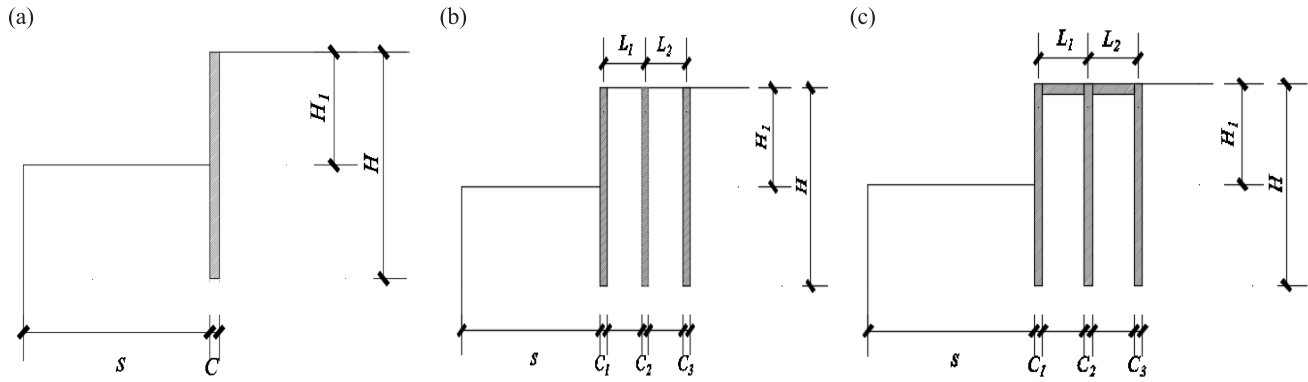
Diagrams of various retaining structures; (a) Cantilever retaining structure; (b) Three-row cantilever retaining structure; (c) M-shaped retaining system
